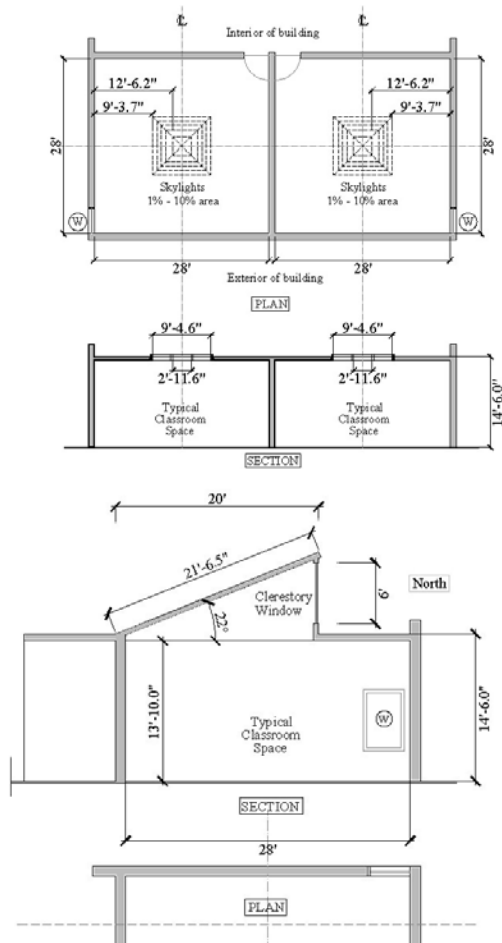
Plan and section of typical classroom showing proposed skylight and clerestory cases. The dotted lines in the skylight cases indicate the varying sizes of skylights.
